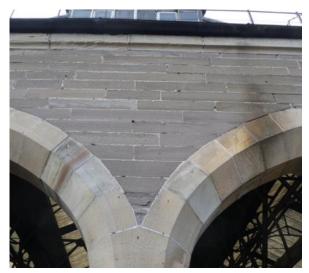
Stugged ashlar for the walls with lighter detailing on the arches.
